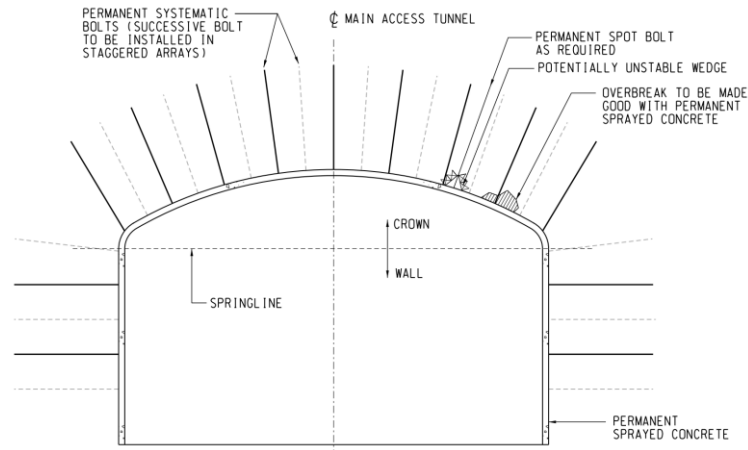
Excavation Profile and Permanent Rock Reinforcement of MAT
